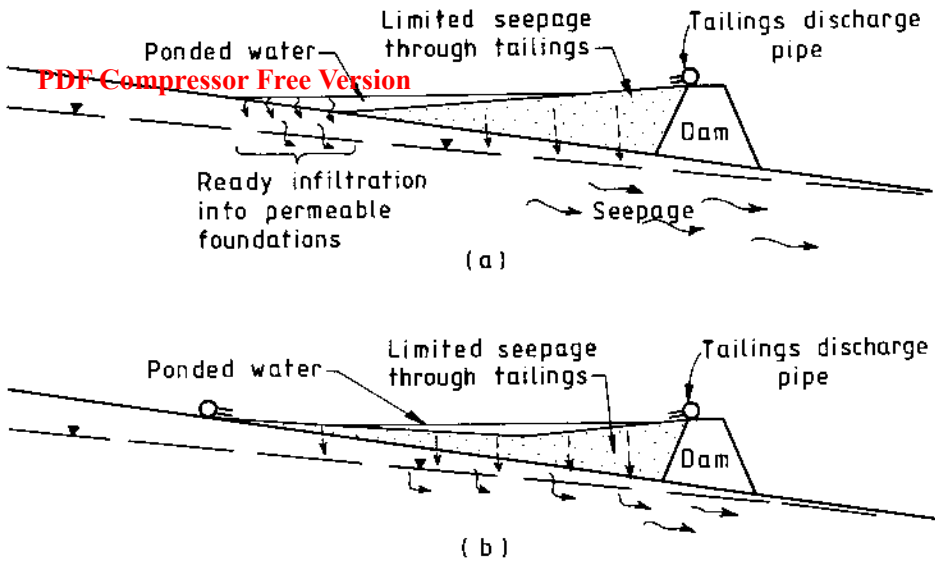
Controlled placement of tailings a) tailings not covering foundation; b) tailings covering foundation.
